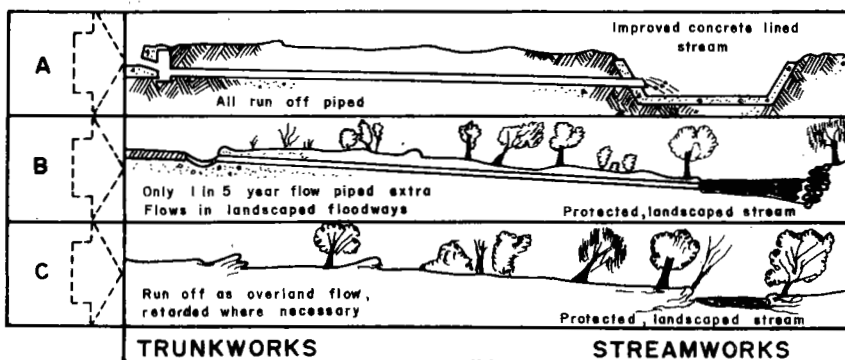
ALTERNATIVE TRUNK/STREAMWORK SYSTEMS
